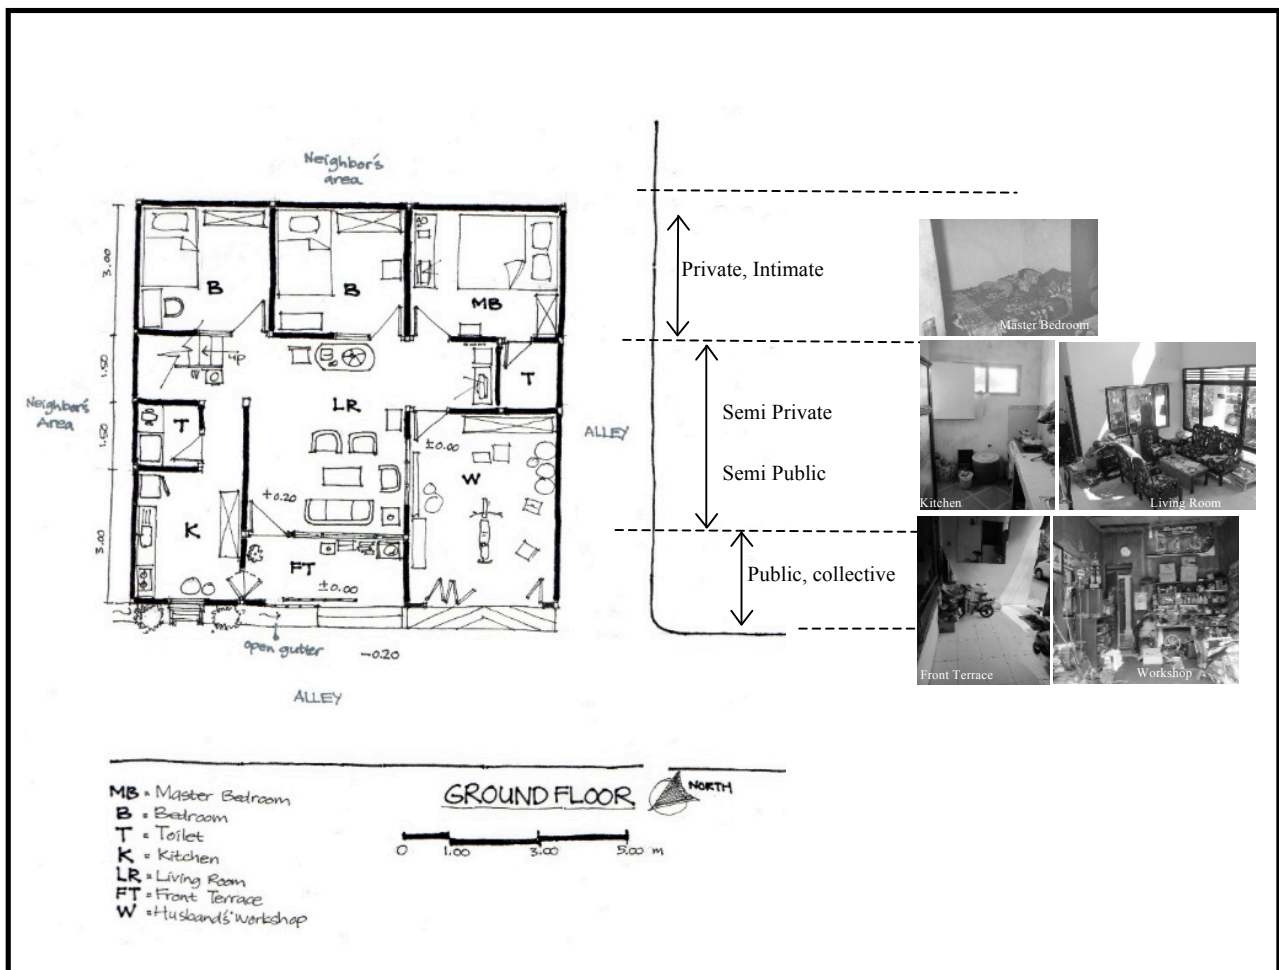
Bu Nur's house plan, the kitchen and terrace are connected by a stable door
